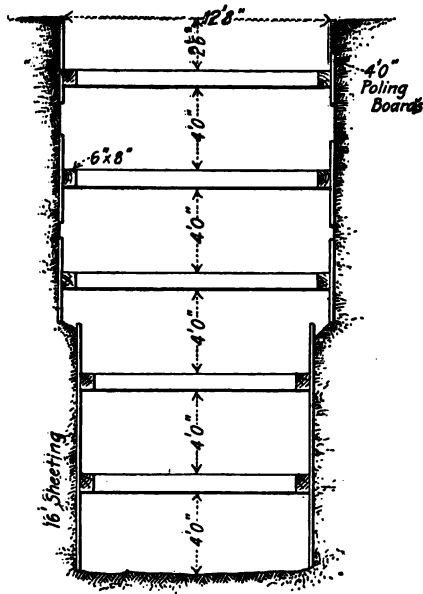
Poling boards and vertical sheeting for sewer 7 ft. 6 in. by 6 ft. 8 in.
